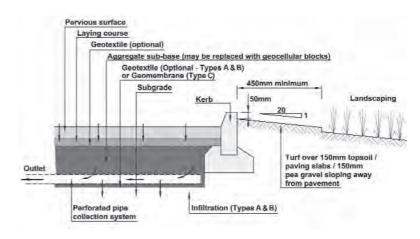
Landscaping detail for pervious pavement (adapted from Wilson et al, 2004)
